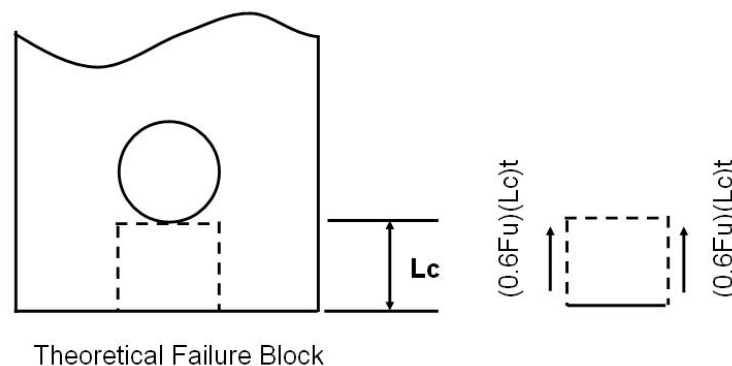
Theoretical Bearing Failure Mechanism
